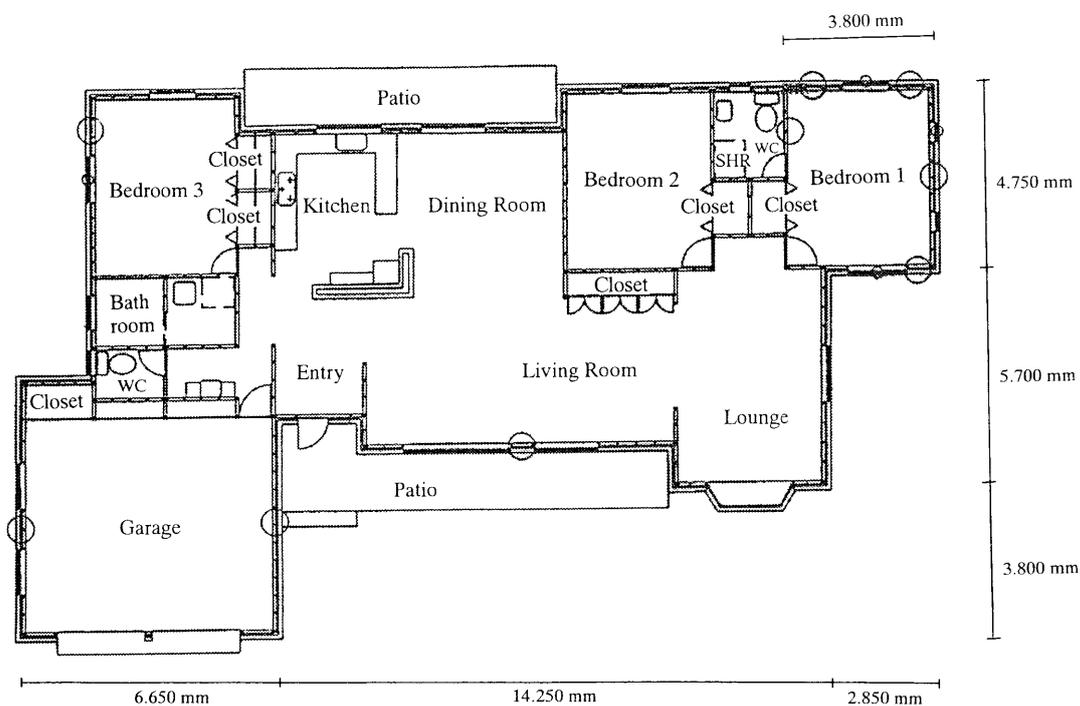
The floor plan of the newly-built brick house (SHR: Shower room).
